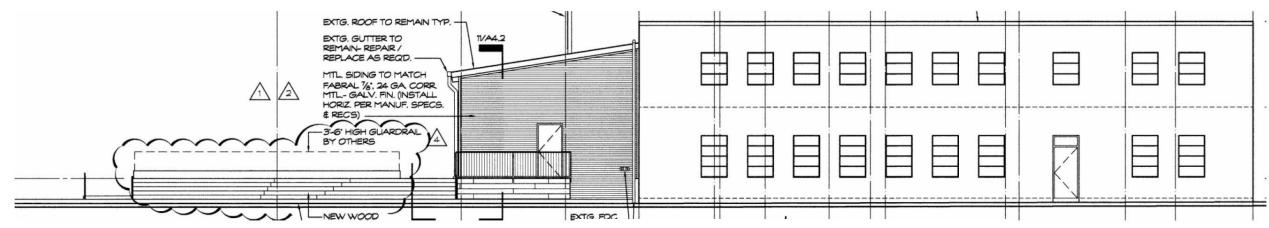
Exhibit C – Proposed Phase 1 - New Shell Bldg. & Landscape Improv. (Southeast Side)
